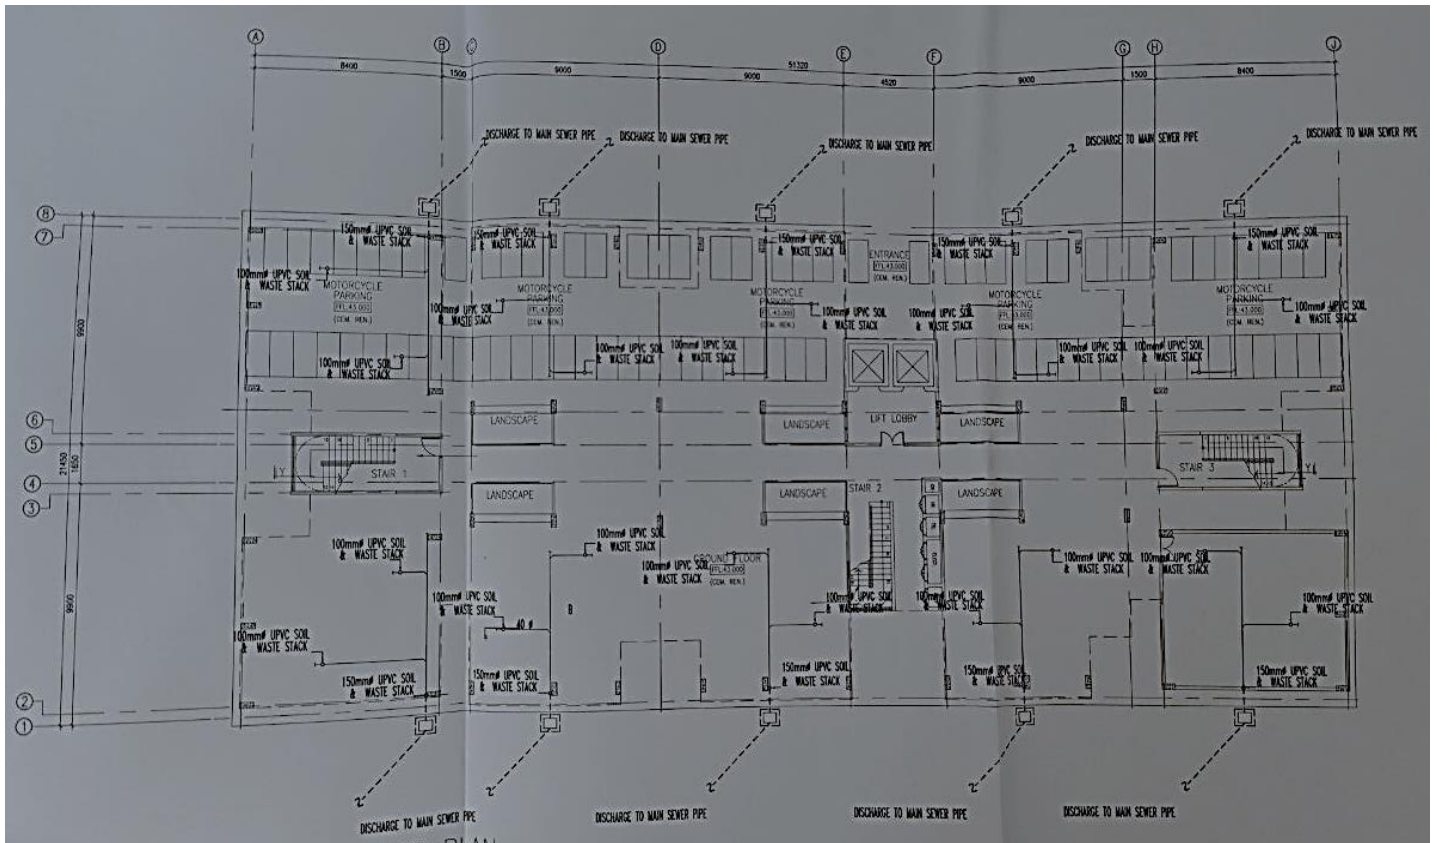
Ground floor plan of Block A3 Unicity building obtained from Unimap Holding
